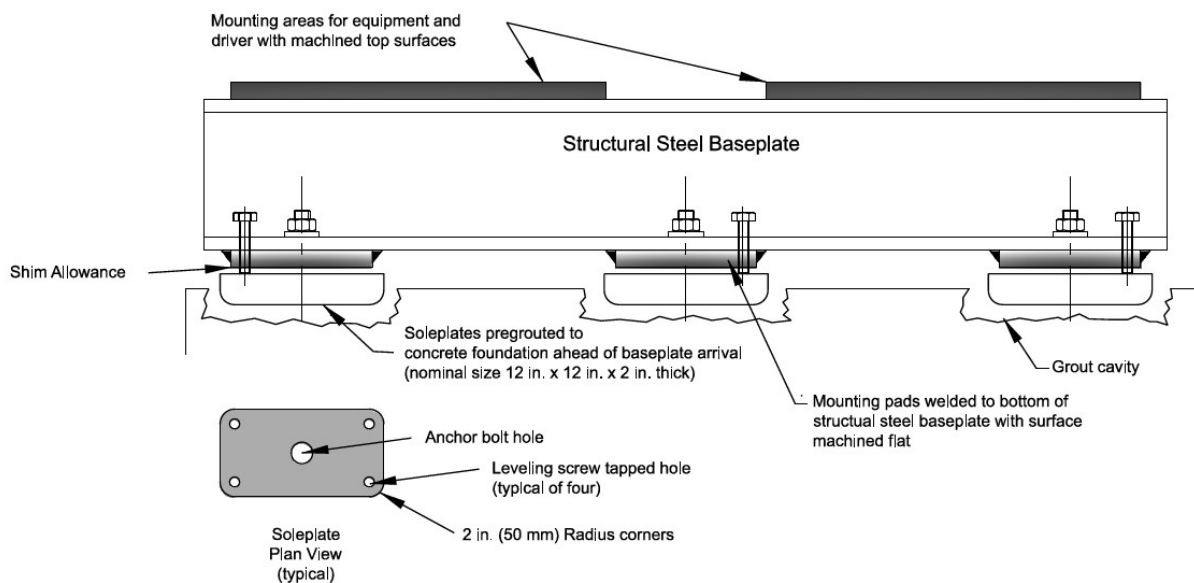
Typical Soleplate Arrangement for Baseplate Mounted Special-Purpose Equipment
